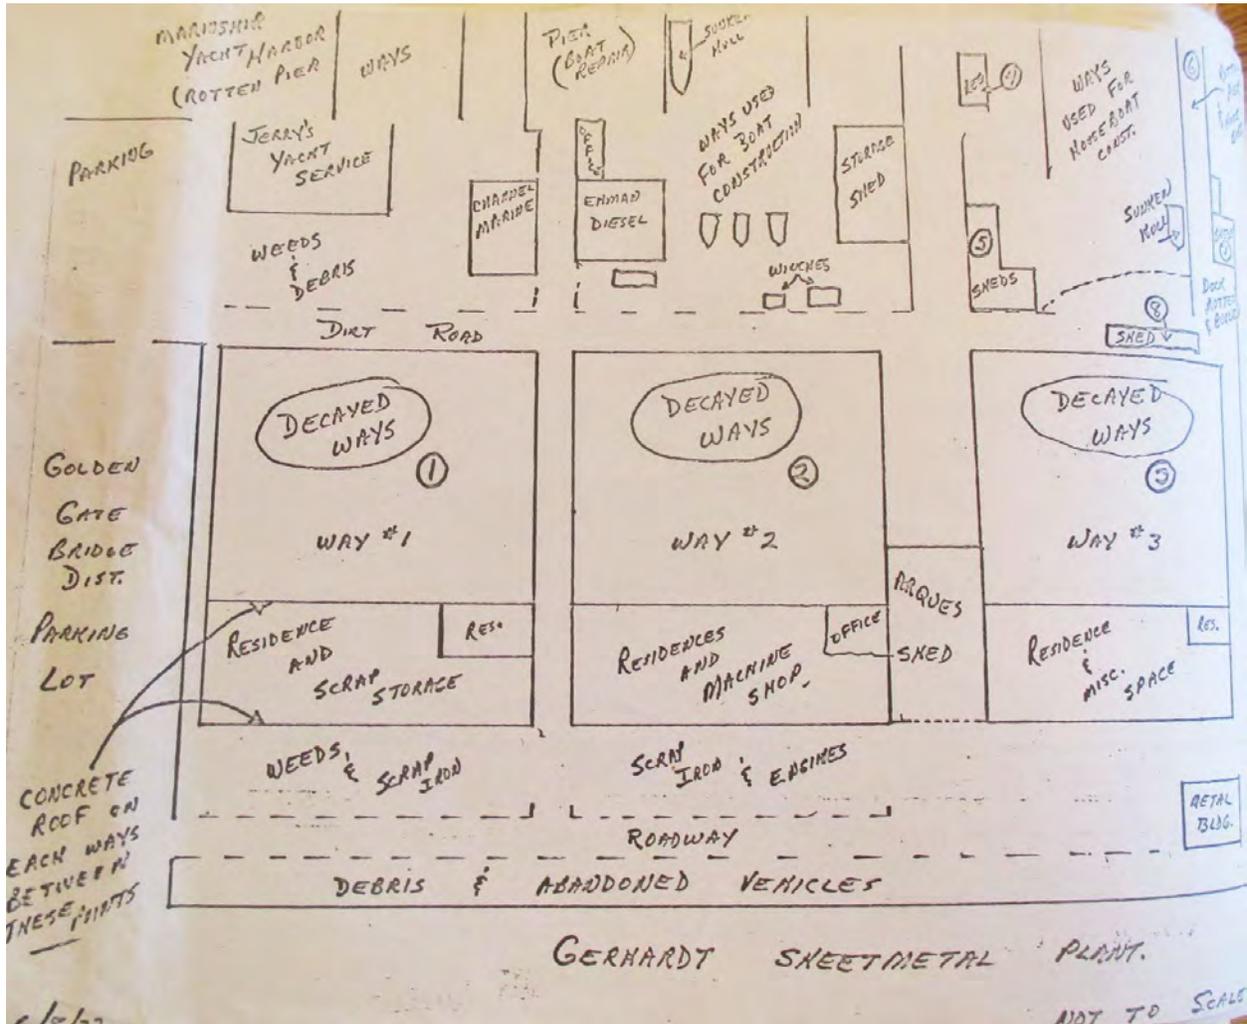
Hand-drawn sketch plan of Arques Shipyard and Marina, 1972
